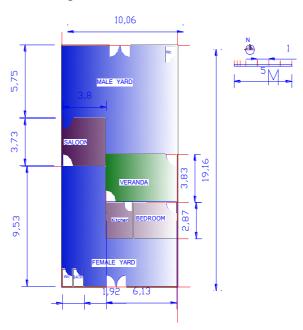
ground floor plan in Mohammed Hashim House (Source: Author)
